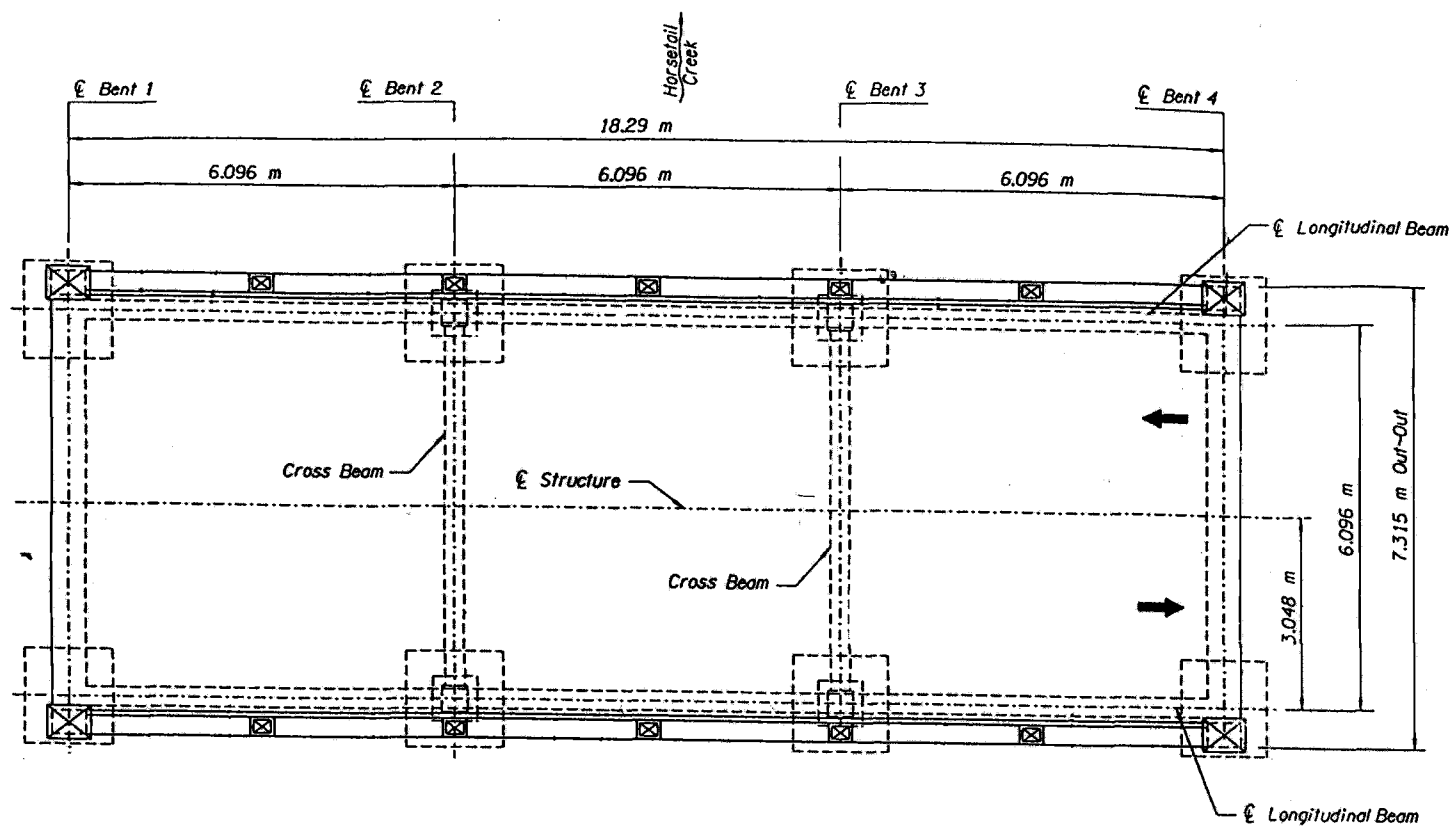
Horsetail Creek Bridge Plan (Not to scale)
